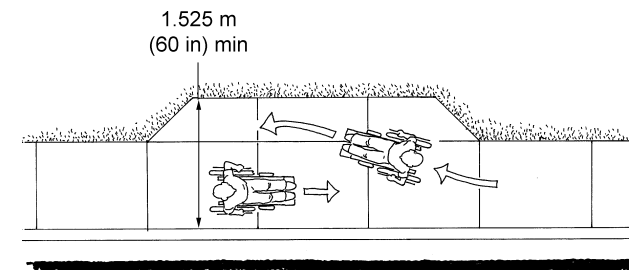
Additional right-of-ways provide passing spaces on narrow sidewalks.
